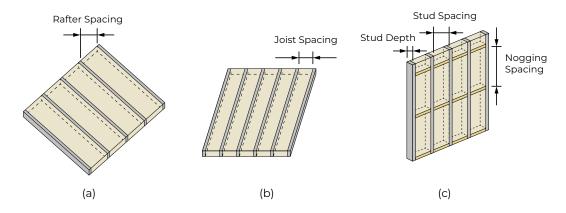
Diagrammatic illustrations of thermal bridging in insulated, repeating steel frame elements for (a) a roof without a roof cavity, (b) a floor or ceiling with a roof cavity and (c) a wall.
